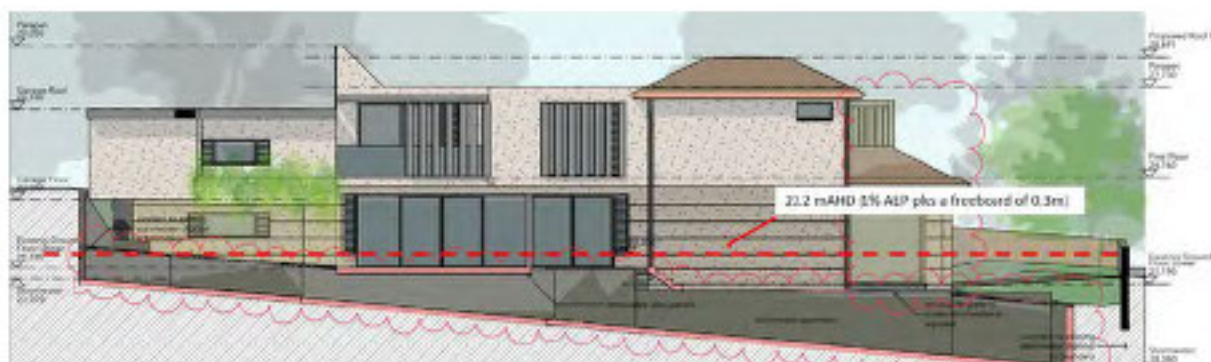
Annotated House 1 West Elevation (DA 15 Rev B)
